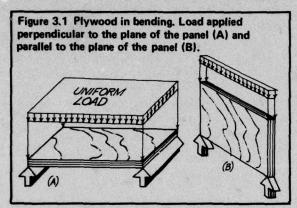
indicates the direction of loading relative to the plane of the plywood panel as specified in this Section. For computing section properties of plywood used vertically as in Figure 3.1(B) and for the design of such applications, as in box beams, see PDS Supplement 2. For recommendations on designing plywood beams with laminated webs see Research Report Number 124 available from APA.
